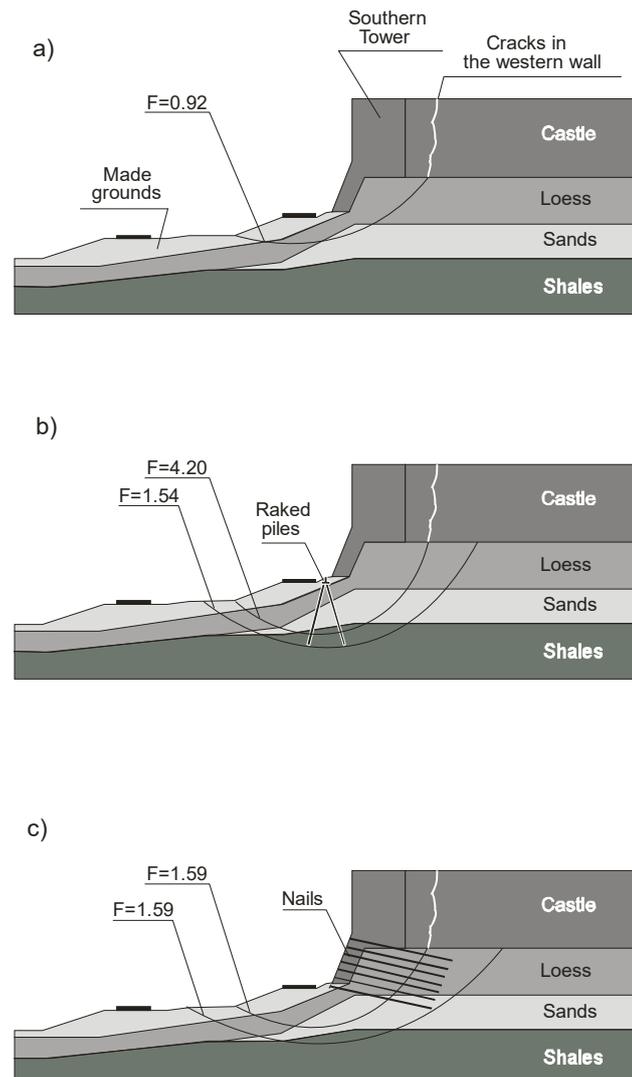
Stability analysis: a) slope stability before stabilisation, b) slope stabilized with piling system, c) slope stabilized with nailing system
